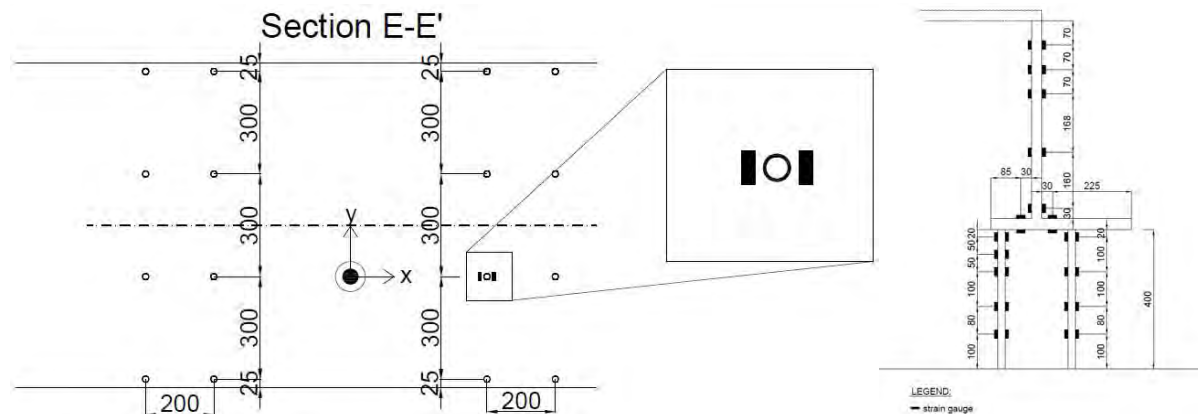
Piles locations under abutment footings and locations of the strain gauges on the wall and the piles
